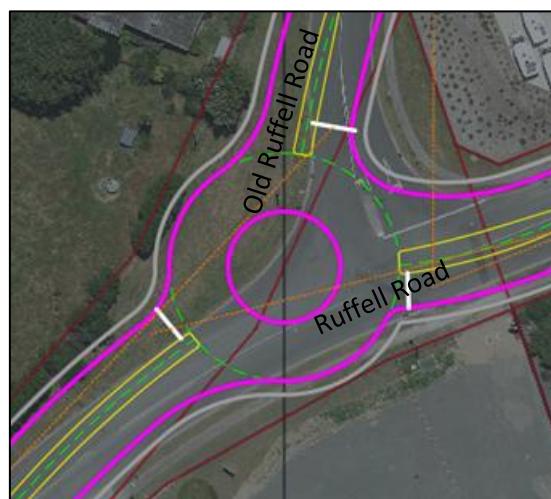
Old Ruffell Road/Ruffell Road roundabout concept
